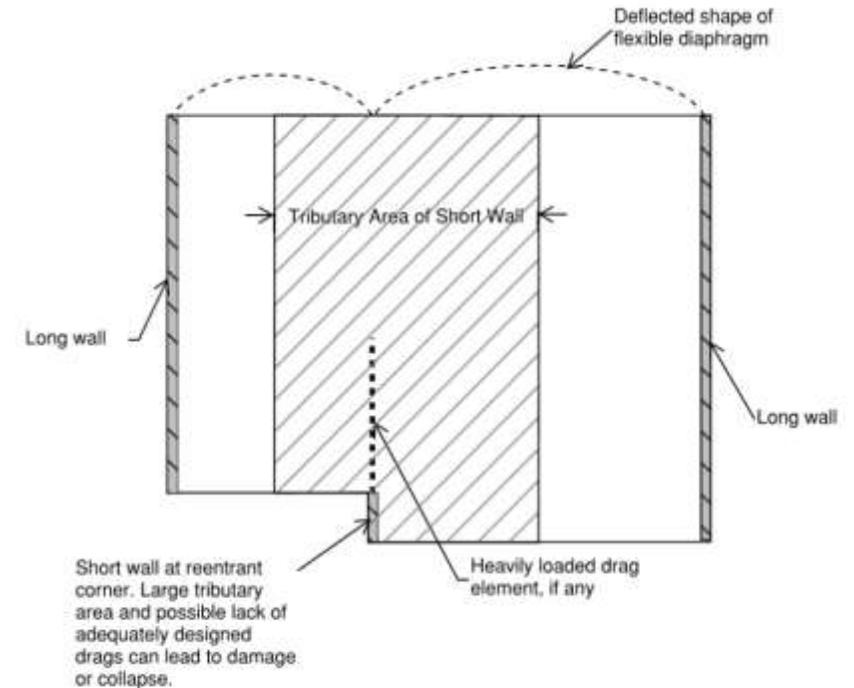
Rigid wall, flexible diaphragm building with short wall at small reentrant corner.
